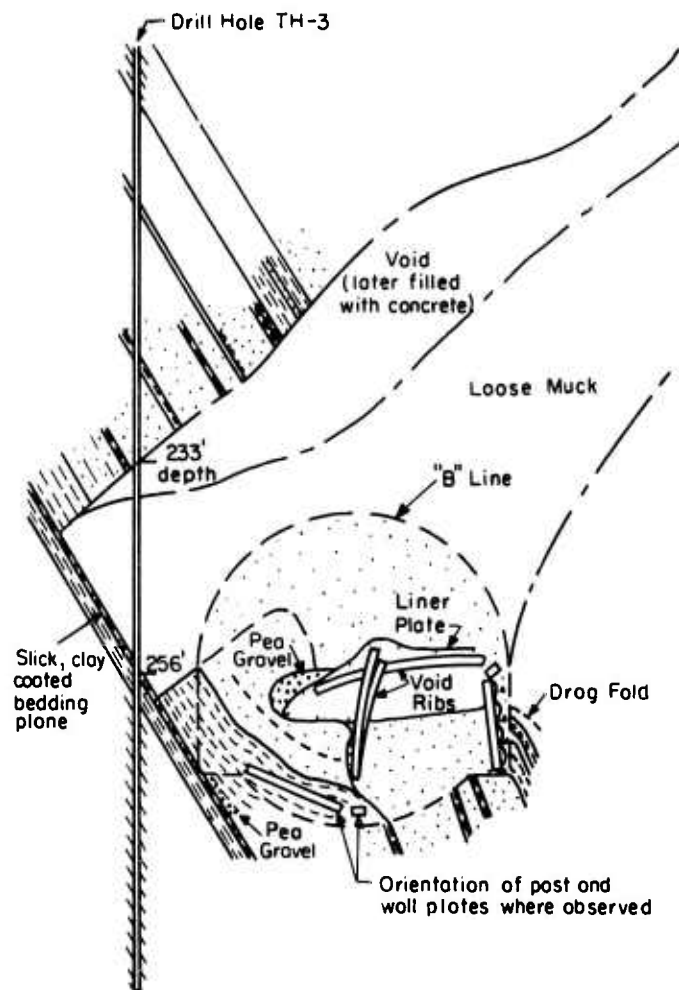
E COMPLETE FAILURE - CASTAIC DIVERSION TUNNEL
